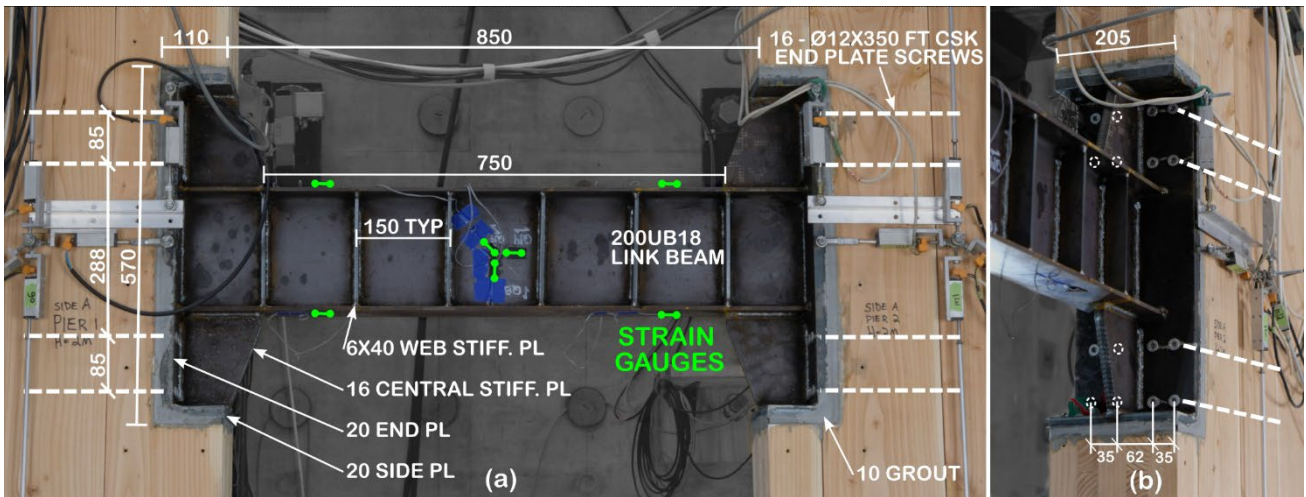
Typical steel link beam (200UB18) between CLT walls: (a) elevation and (b) screwed end plate connection.
